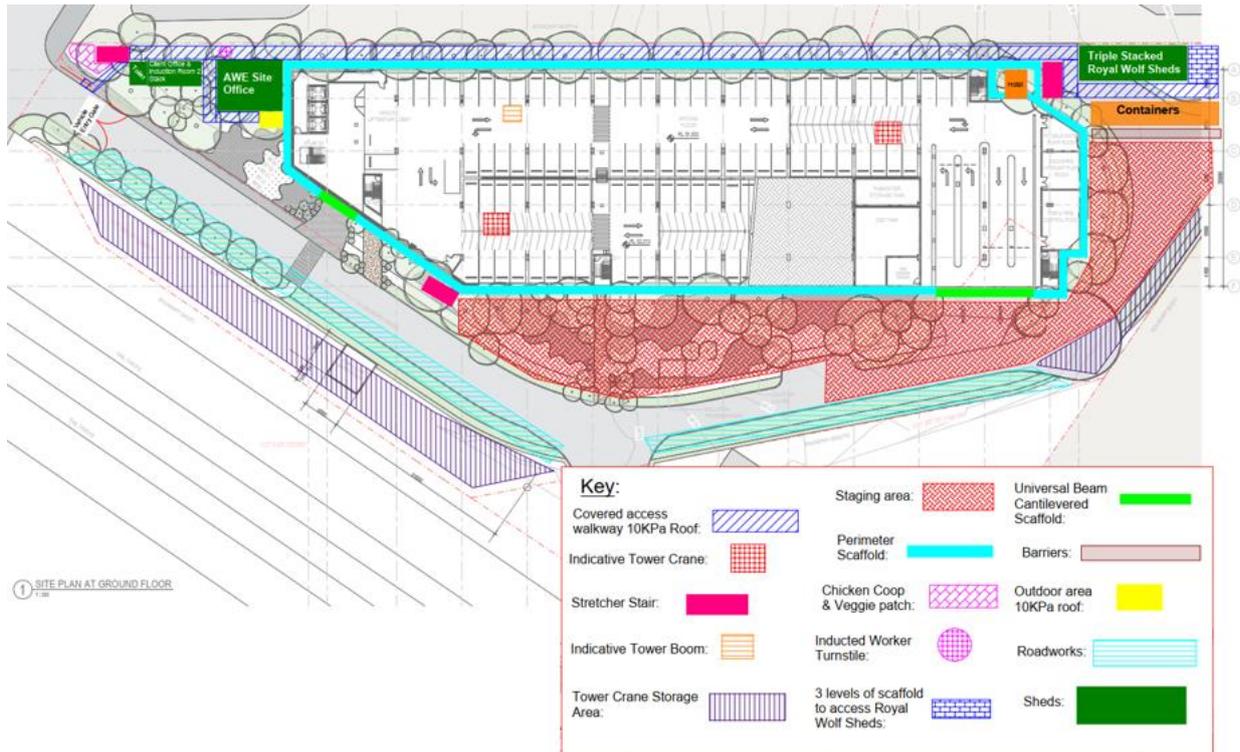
Indicative site establishment plan outlining temporary site access, accommodation and storage facilities (subject to contractor requirements)
